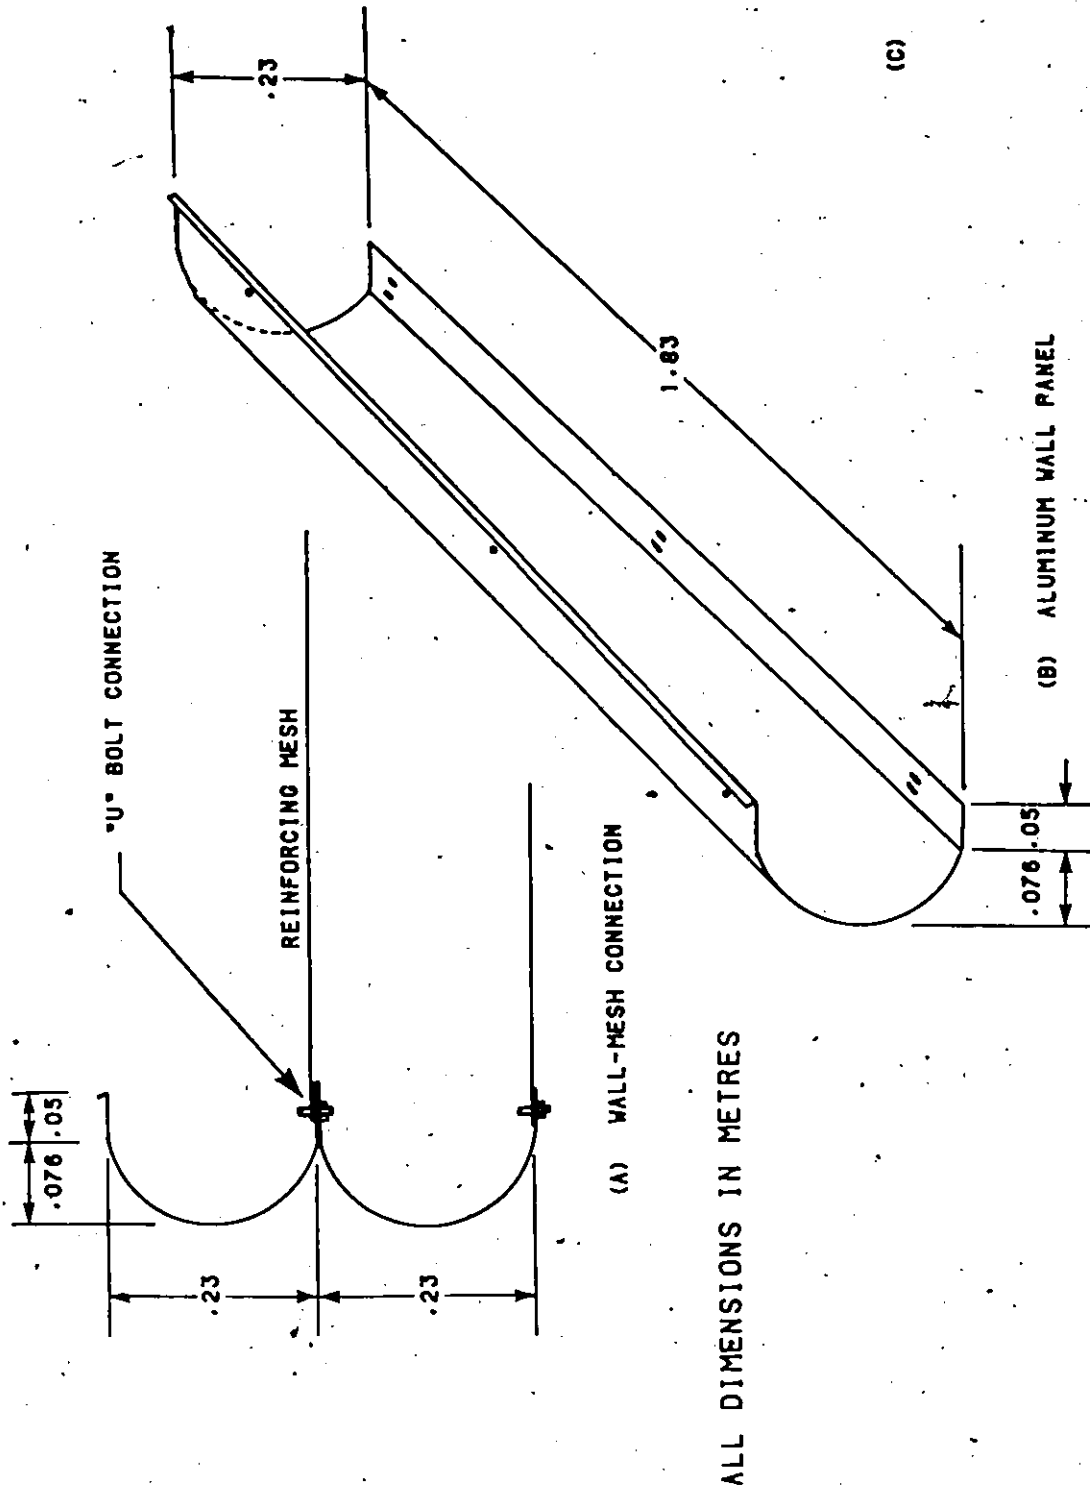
TYPICAL REINFORCED WALL CONFIGURATION
